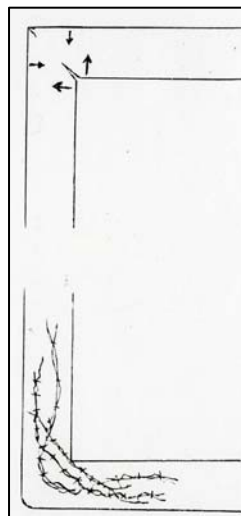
Barbed wire reinforcement at corners. (Image: Karl Ellington)
